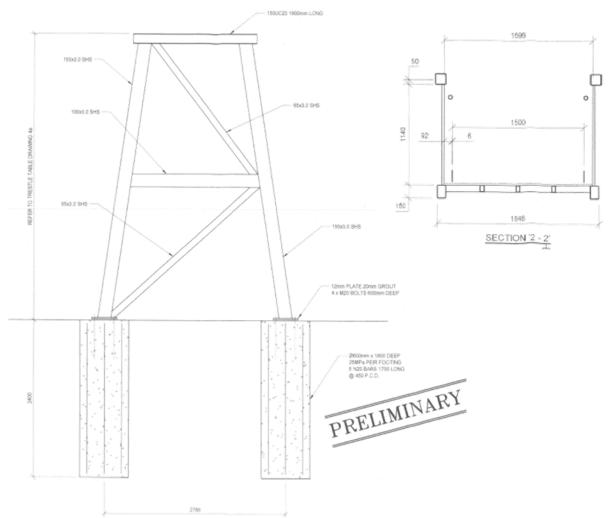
Extract from Concept Drawings showing the proposed trestle and ramp walkway structure adjacent to the viaduct
